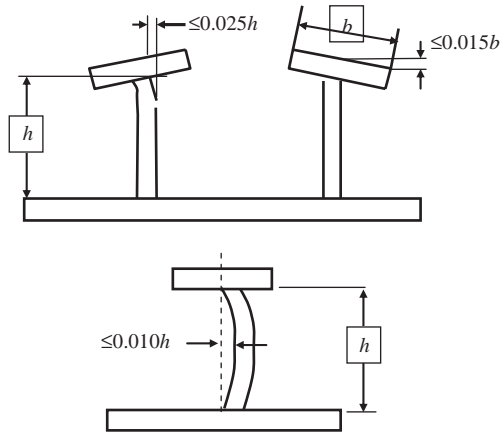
Tolerances for ring stiffener cross section based on ISO.
